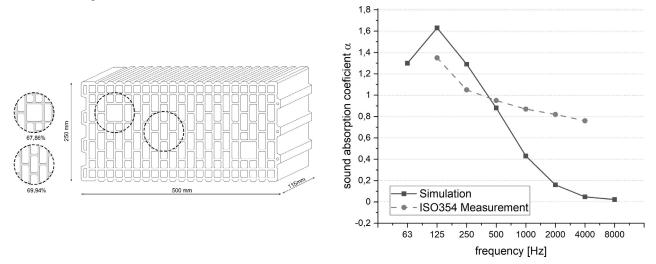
Brick cladding (left: brick detail, right: sound absorption simulation/measurement)
